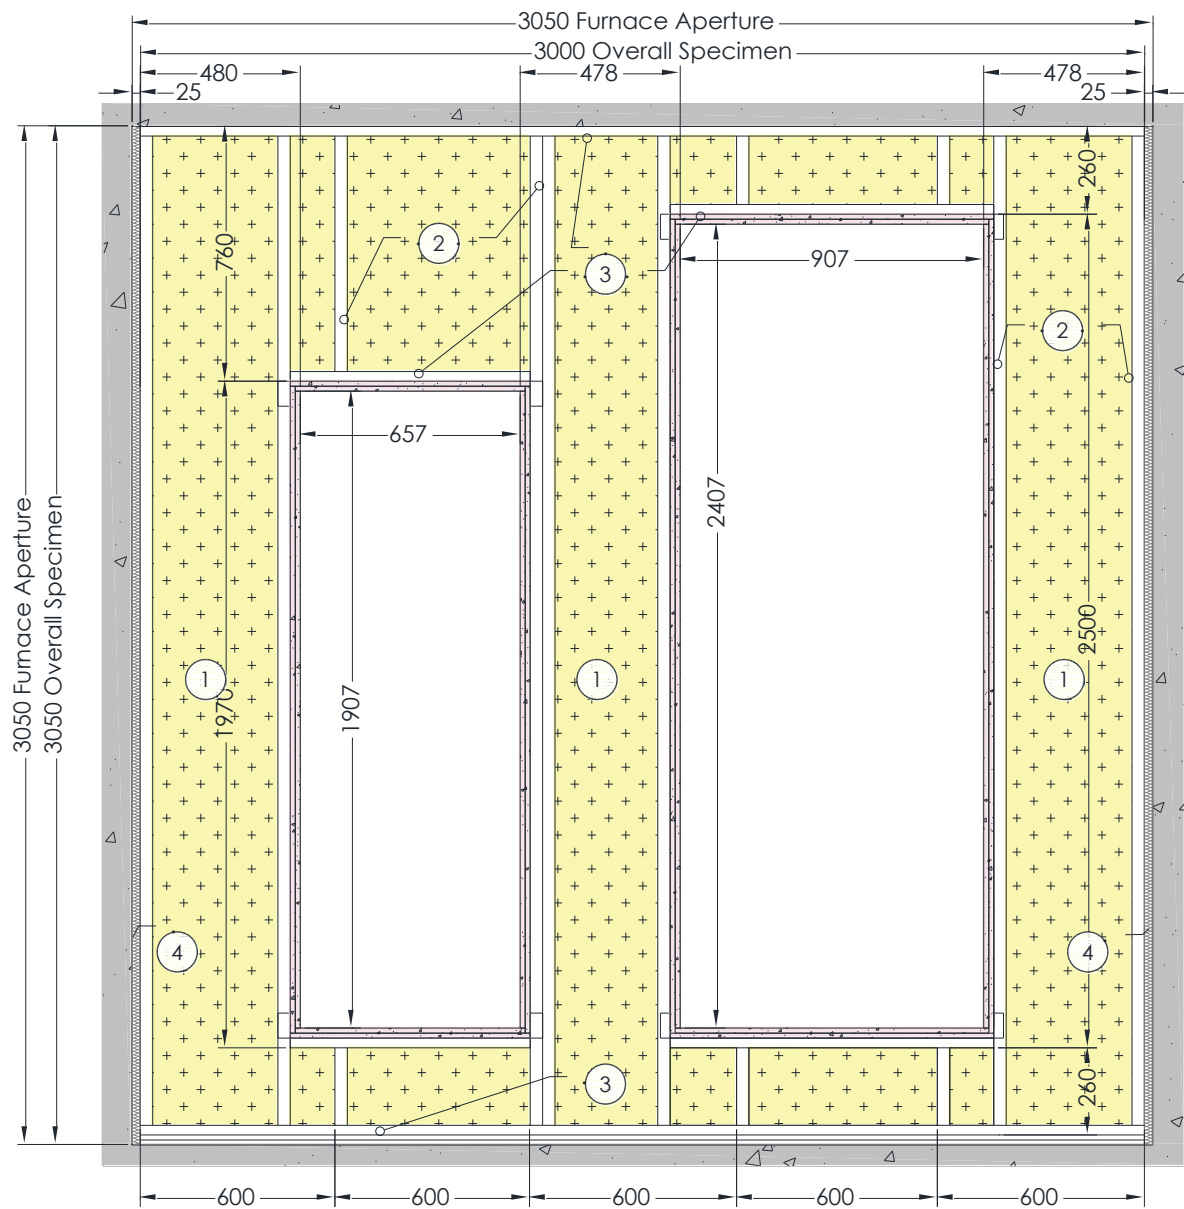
General Elevation Thermocouple Positions - Unexposed face
